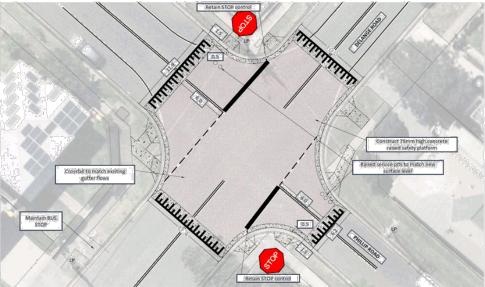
Proposed raised pavement treatment at the intersection of Delange Road and Phillip Road, Putney
